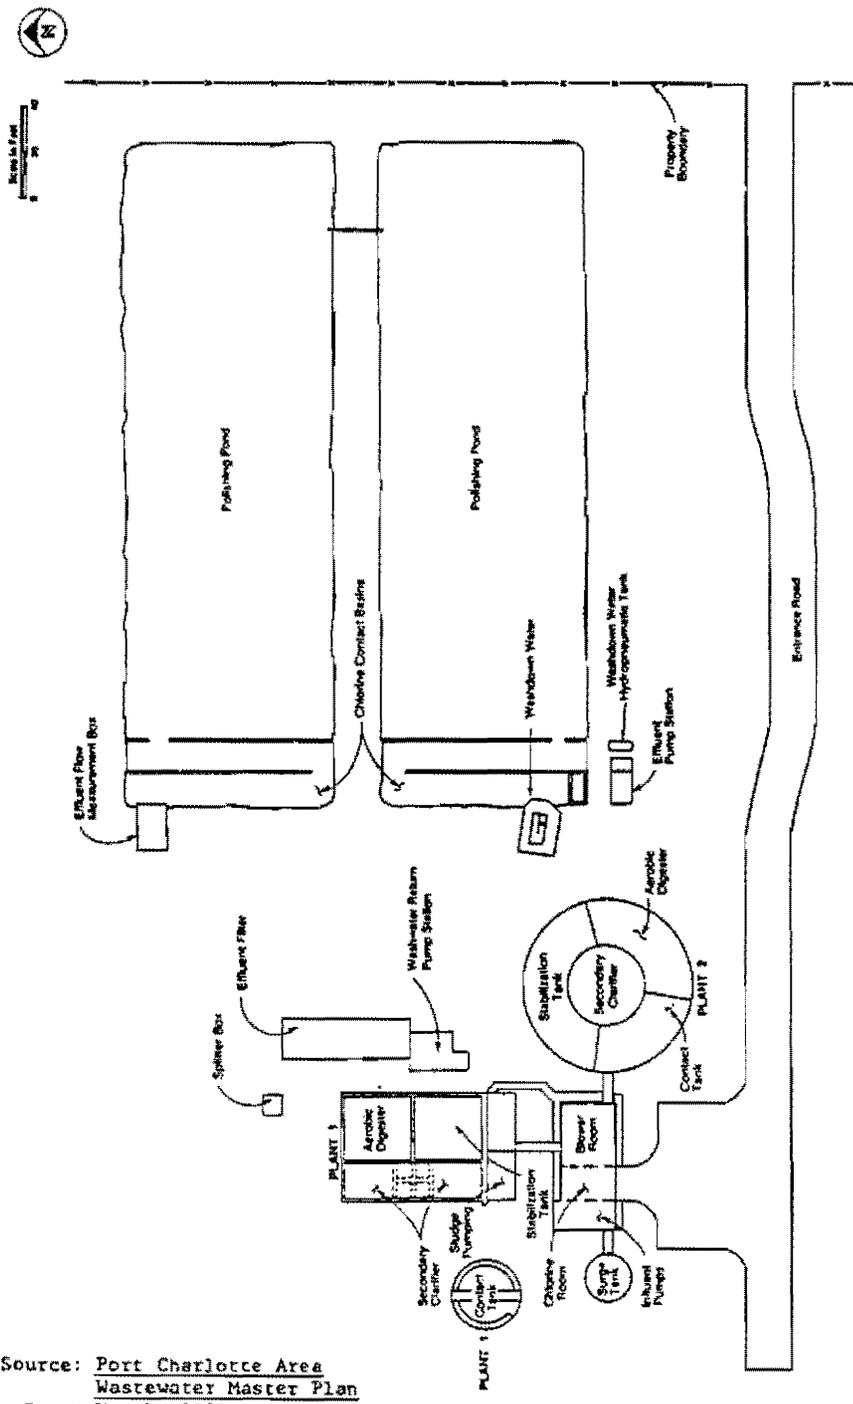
Site Plan for the North Port Wastewater Treatment Plant.
